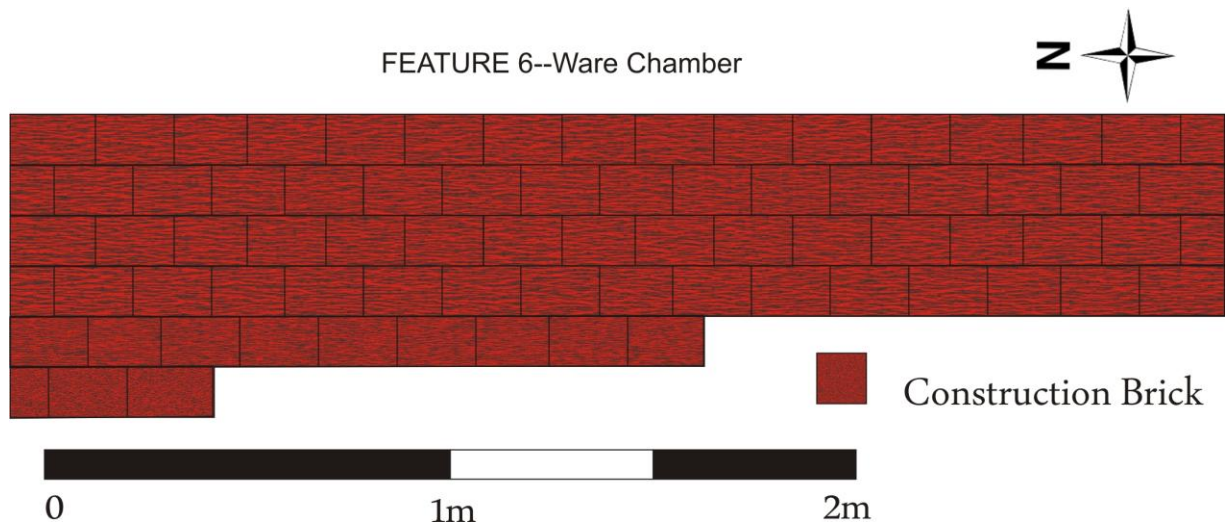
Plan Profile of Feature 6, interior wall segment nearest the firebox
